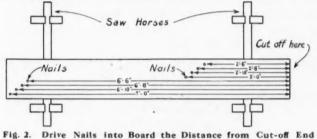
Drive Nails into Board the Distance from Cut-off End You Wish the Trim Pieces to be Cut.
